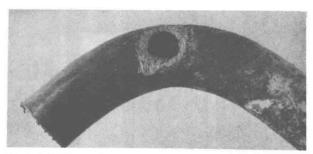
Rat gnawings on a piece of lead pipe.
